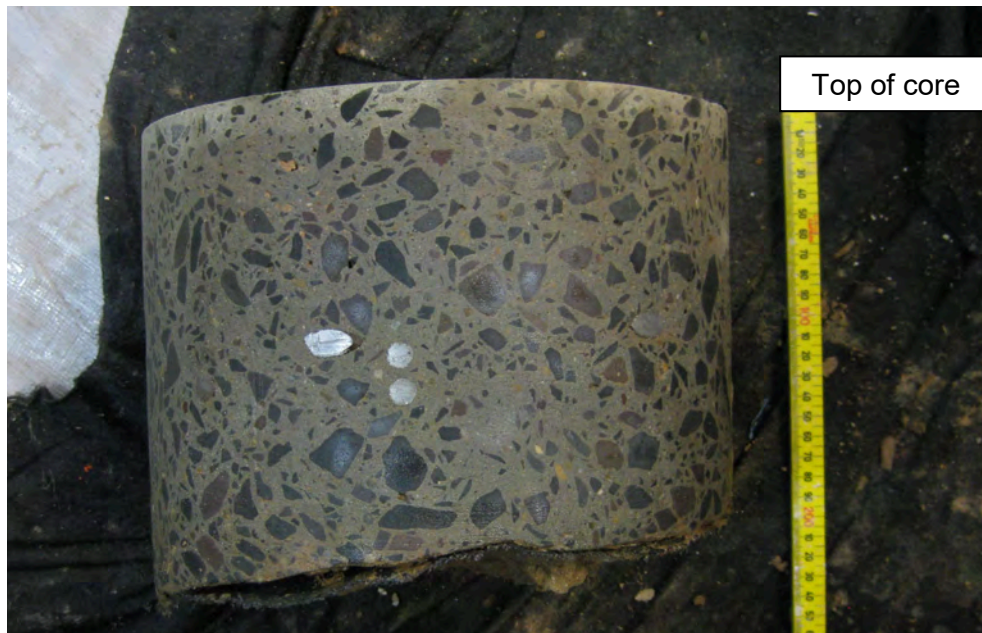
View of concrete core from Borehole BH8. Two layers of reinforcement steel (10 mm diameter) were encountered at 0.09 m and 0.10 m depth, with a layer of plastic at the underside of the slab.
